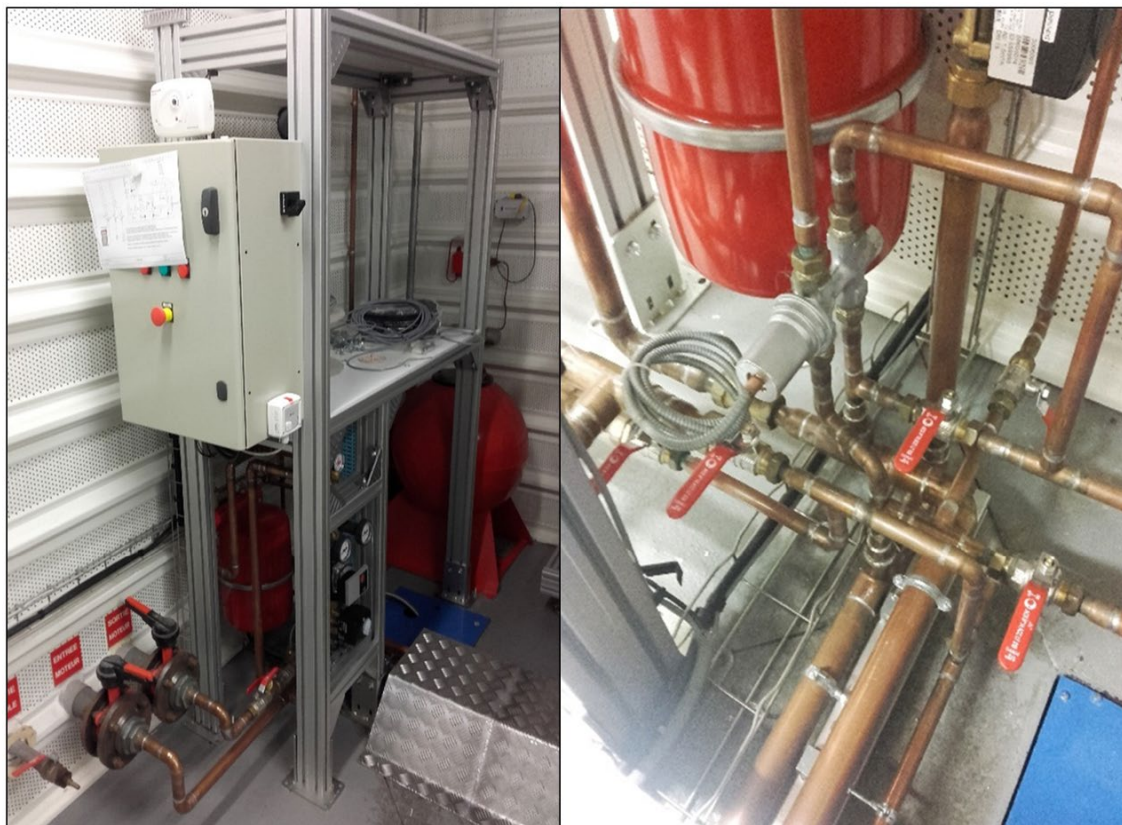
Hydraulic installation between the boiler and the air heaters
